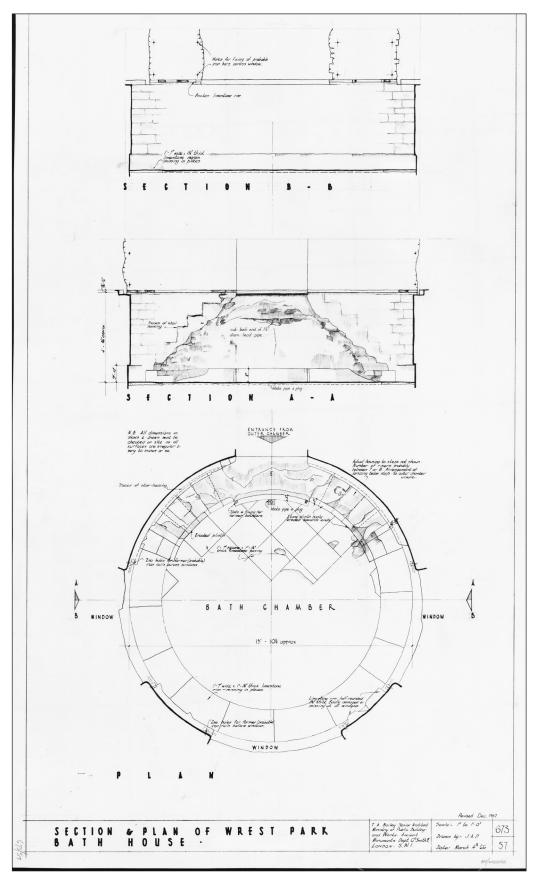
Plan and section of the bath as existing in 1967, with tiles shown on the bottom of the bath (MP_WRE0086 Historic England Archive)
